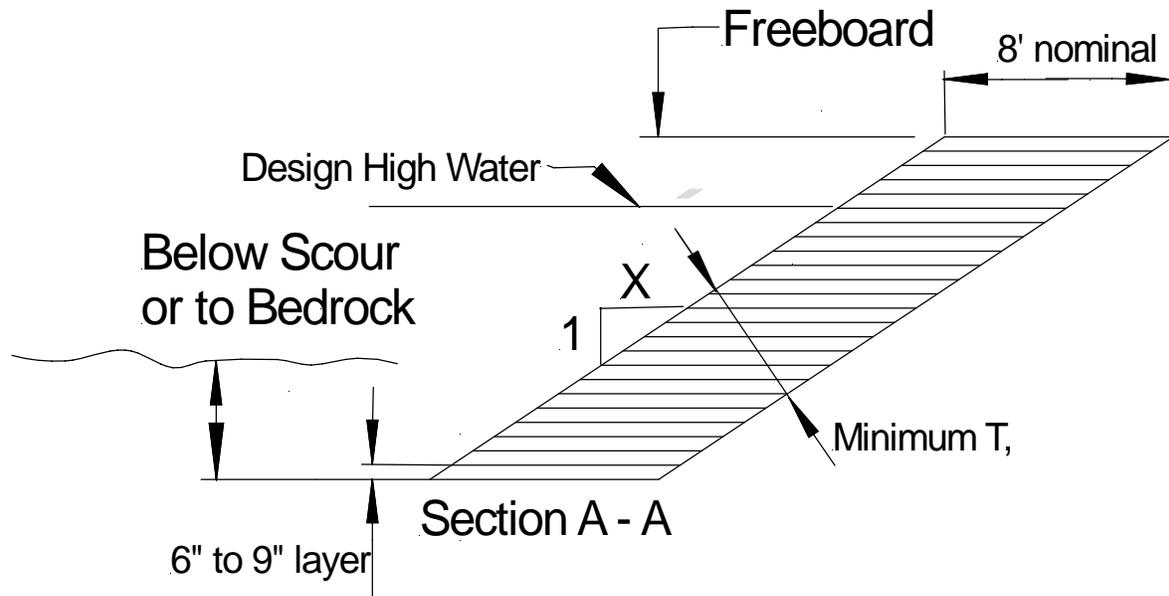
Details And Dimensions Of Three Soil-Cement Facings Design Guidelines
